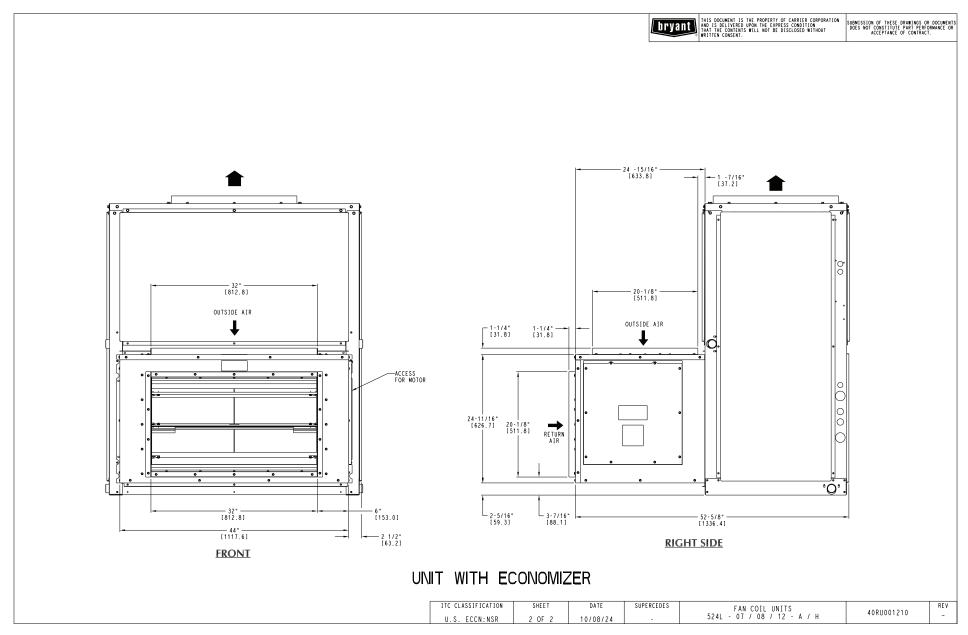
524L\*07-12 Base Unit Dimensions (cont)
